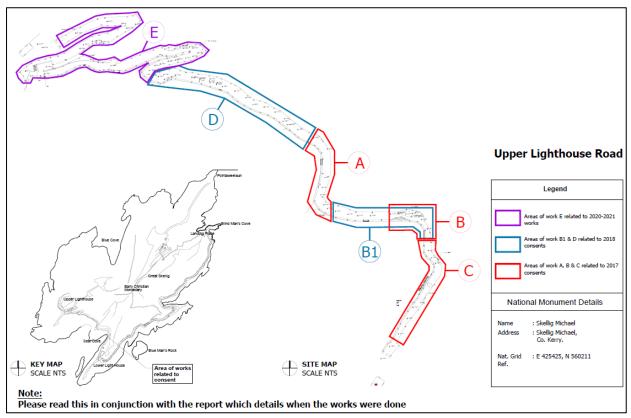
Works to Upper Lighthouse Road 2017 - 2021
